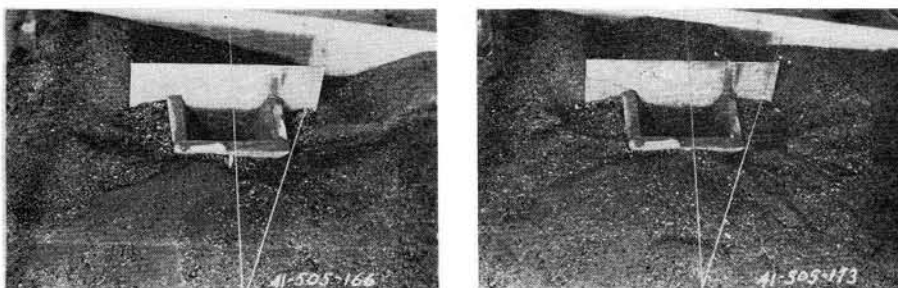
Scour in Vicinity of Inlet of Crawford County, Iowa, Closed Conduit Spillway.
